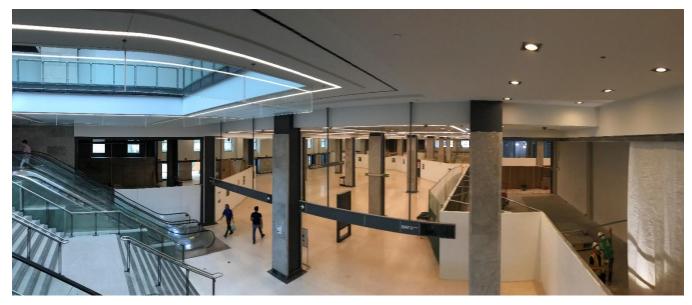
View of the concourse level in the east block of the Union Station Headhouse (historically "Postal Station A" showing ongoing interior construction
